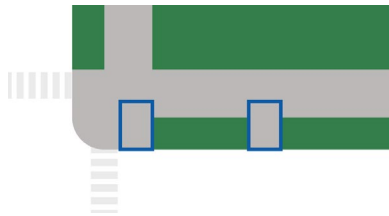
Depicts a scenario in which boarding and alighting areas were fitted into a curbside planting strip that cannot be paved over as part of any sidewalk
